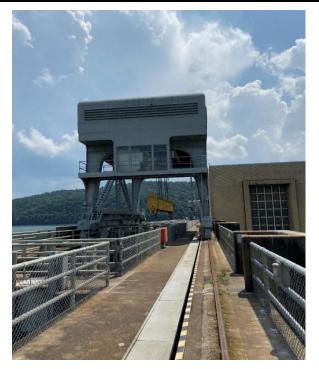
Guntersville Project, trench for electrical conduits of the powerplant intake/dam spillway crane
